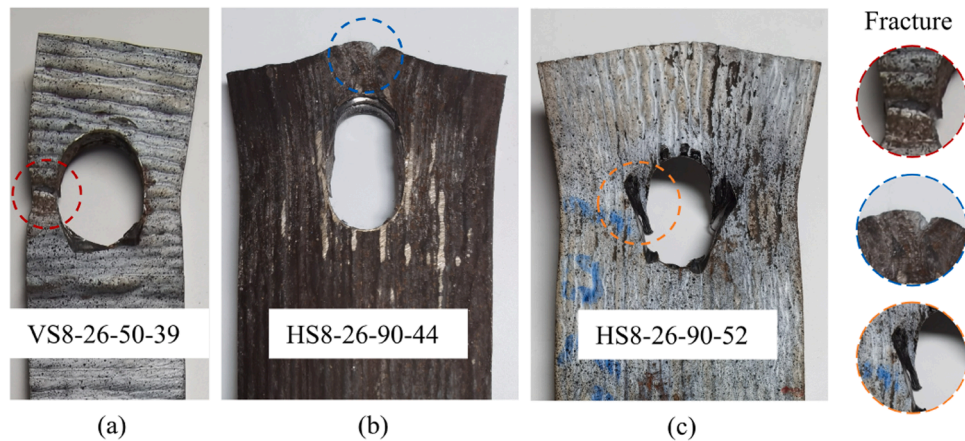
Typical failure modes: (a) net section tension, (b) end-splitting, and (c) tilt-bearing failure.
